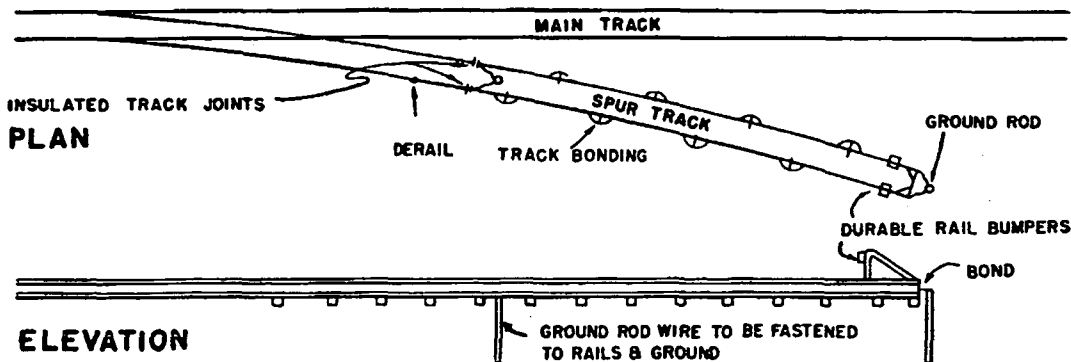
A tank car unloading siding showing bonding of rail joints, insulated track joint, derail, and track grounding
